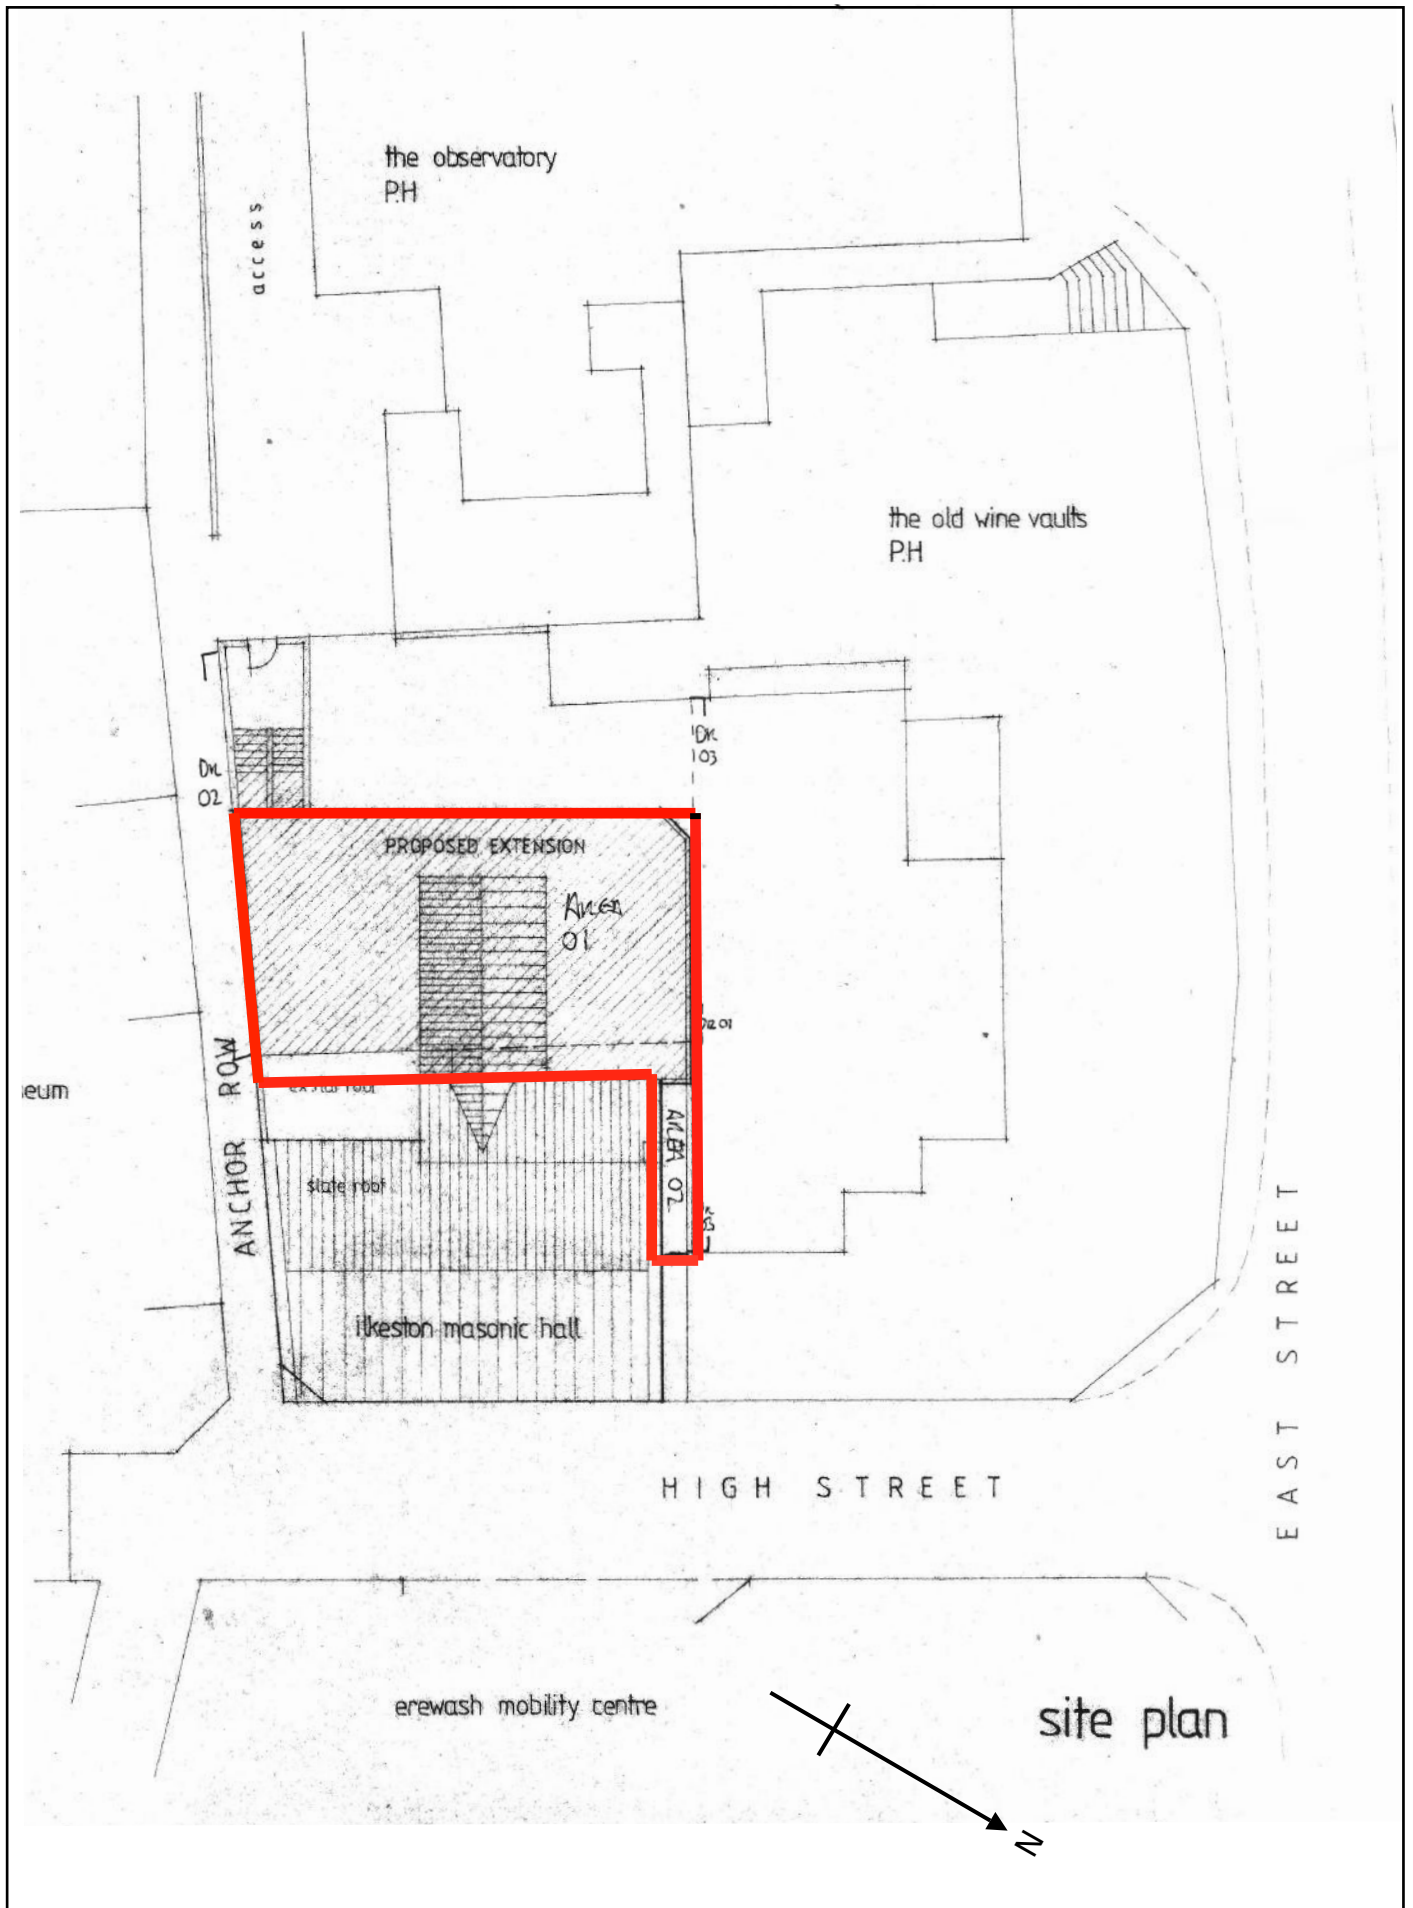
Architect's plan of proposed extension to the Masonic Hall, Ilkeston, with study area highlighted. Scale 1:250.
